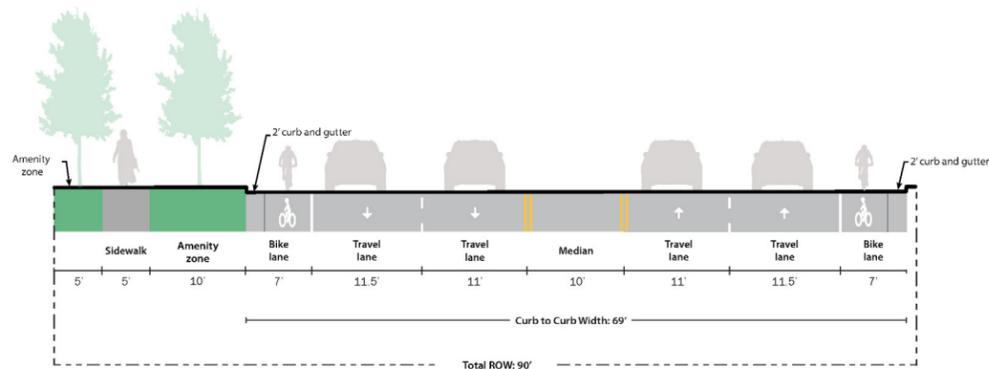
Section C (72nd Avenue East of Depew Street – Looking East)
